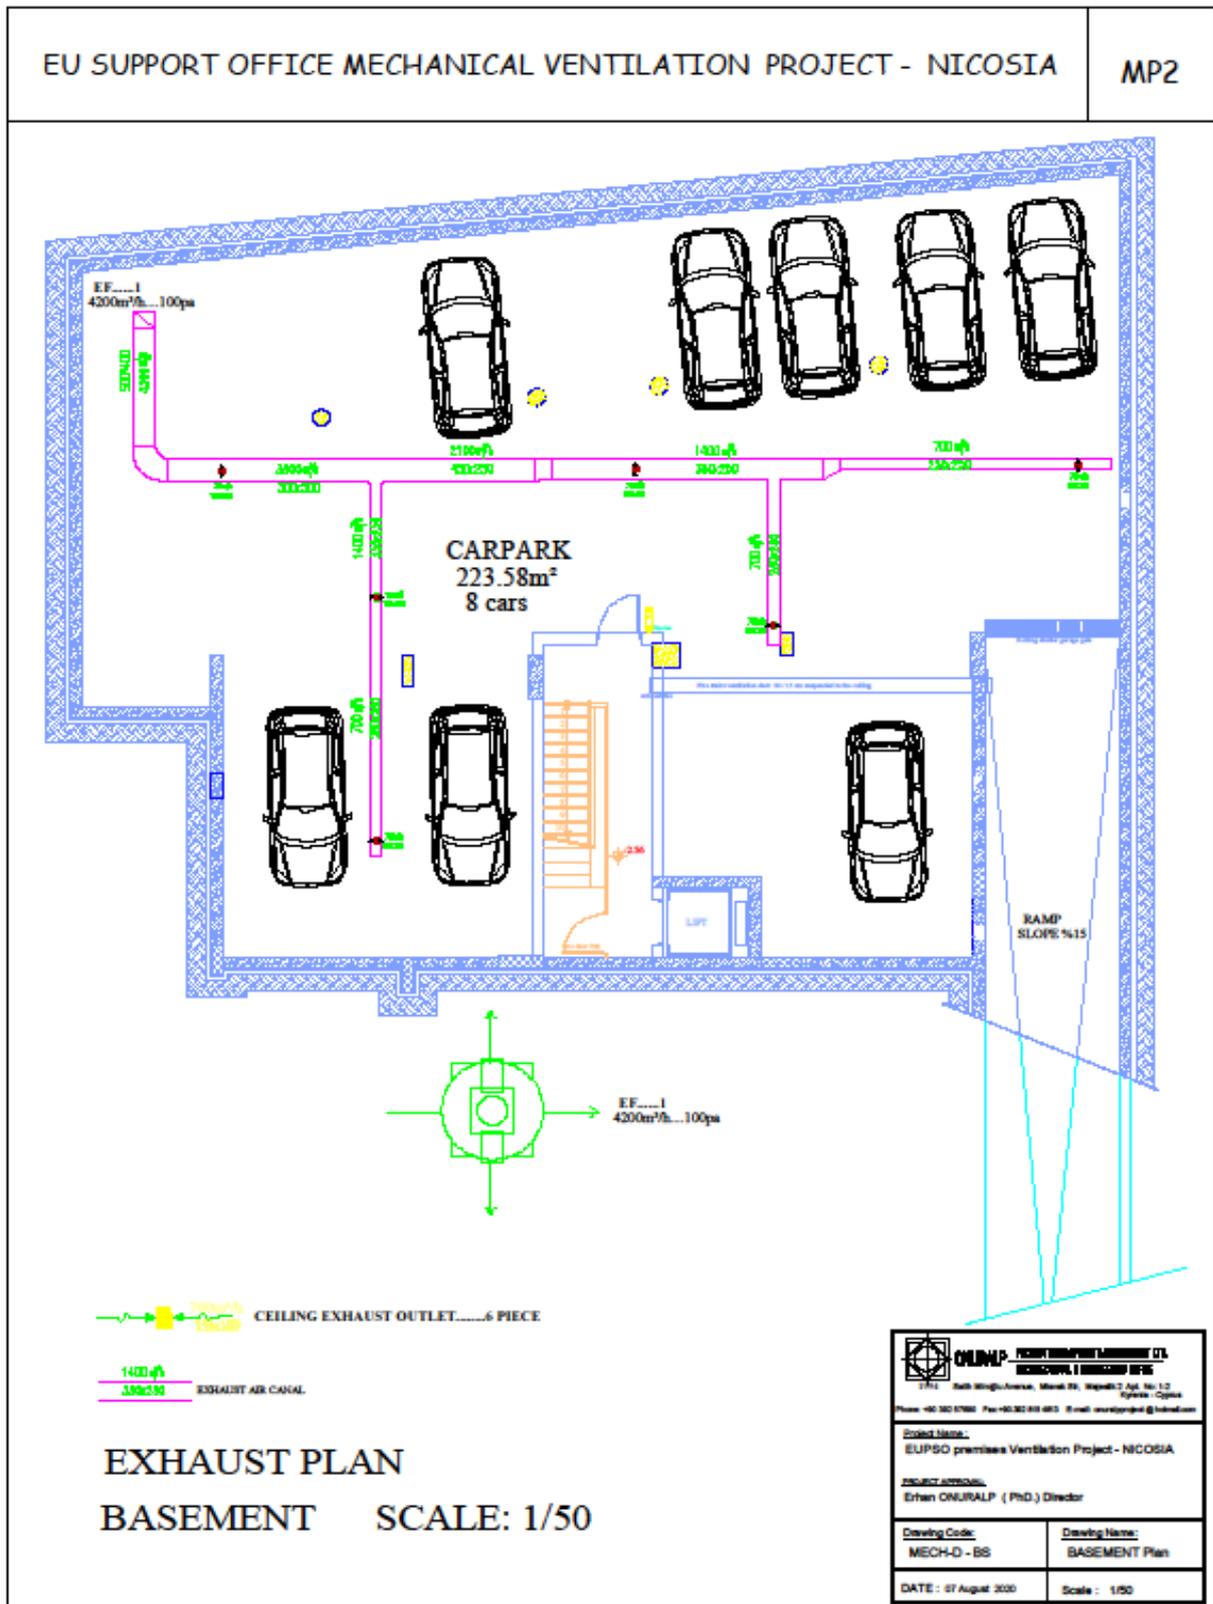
Basement Exhaust Plan – EUPSO project planning MP2
